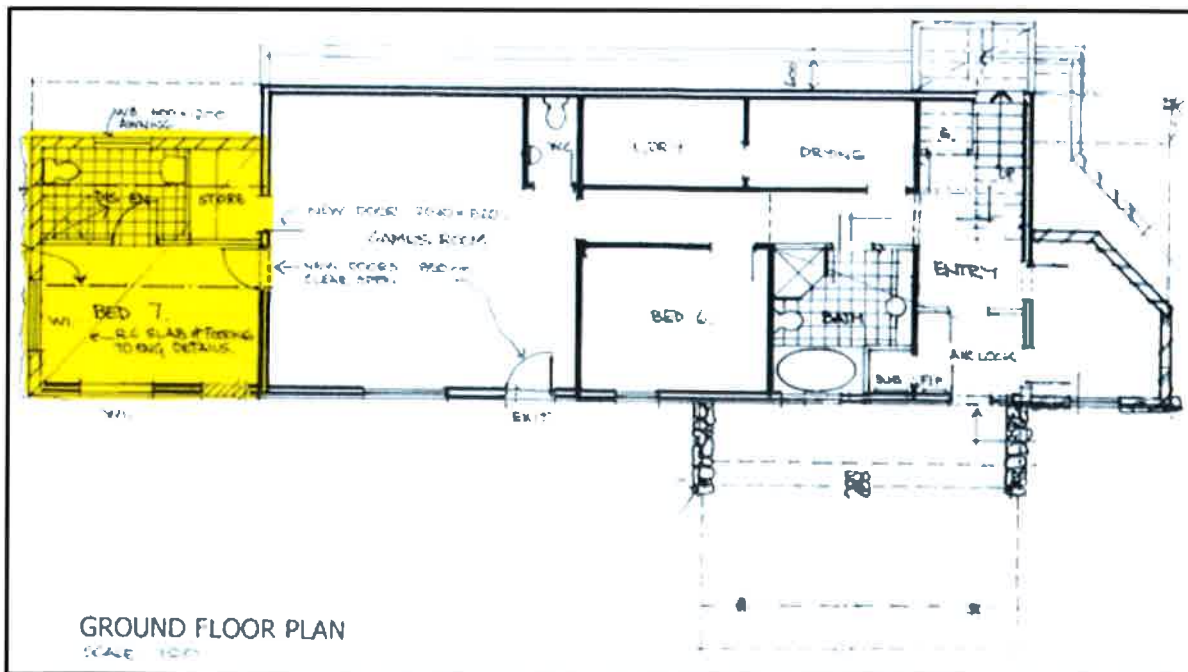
Proposed bedroom and bathroom (highlighted) (Source: Applicant's submitted plan)
